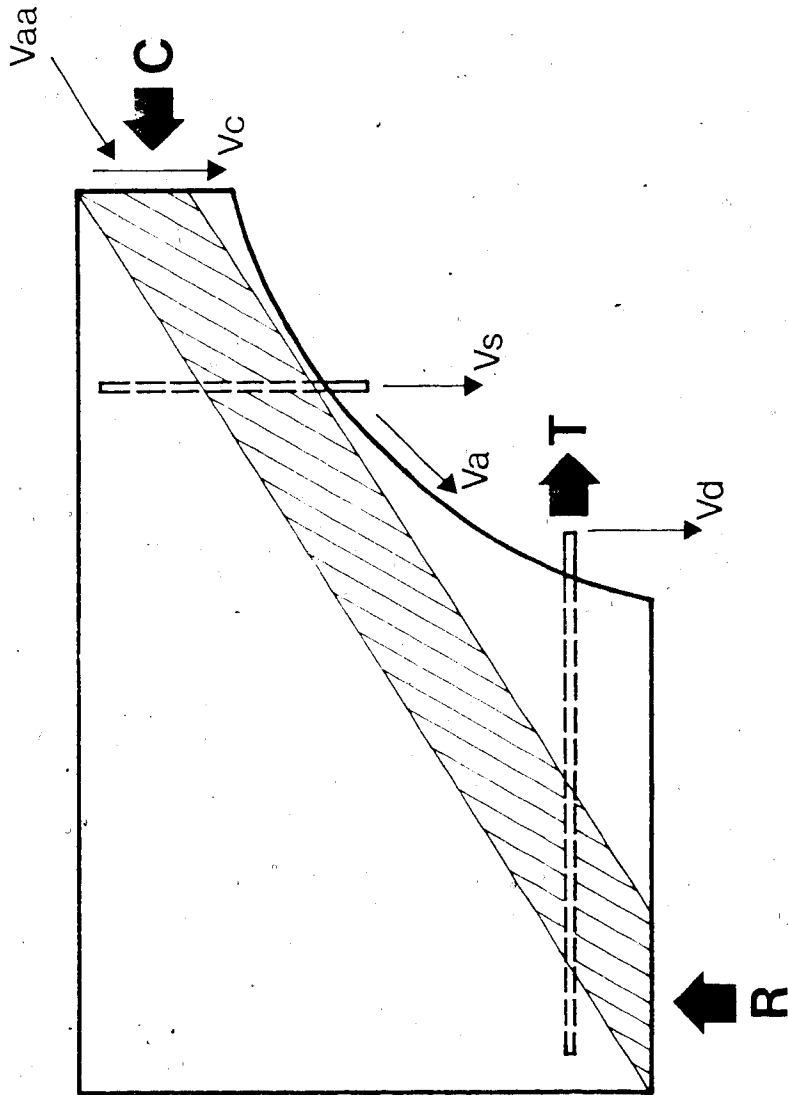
Forces Acting on a Diagonal Crack of a Reinforced Concrete Member
